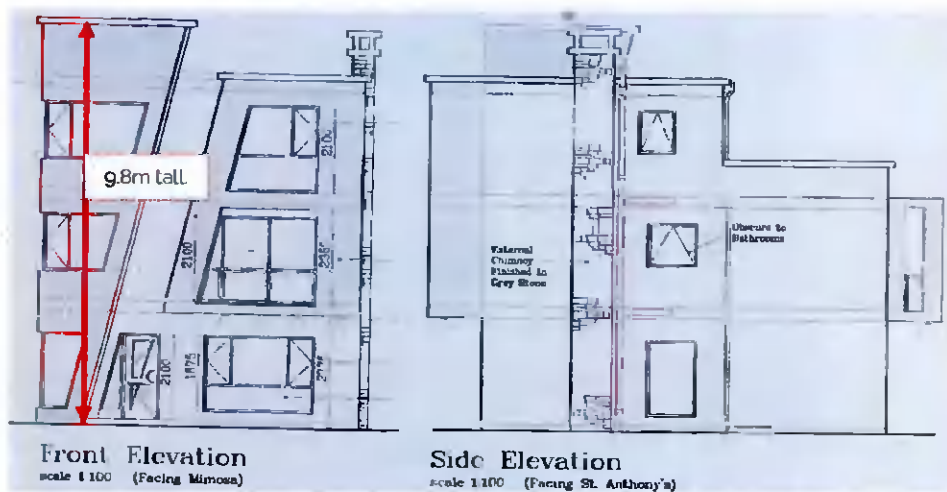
The height of the proposed dwelling's "front" elevation and side elevation facing client's property
